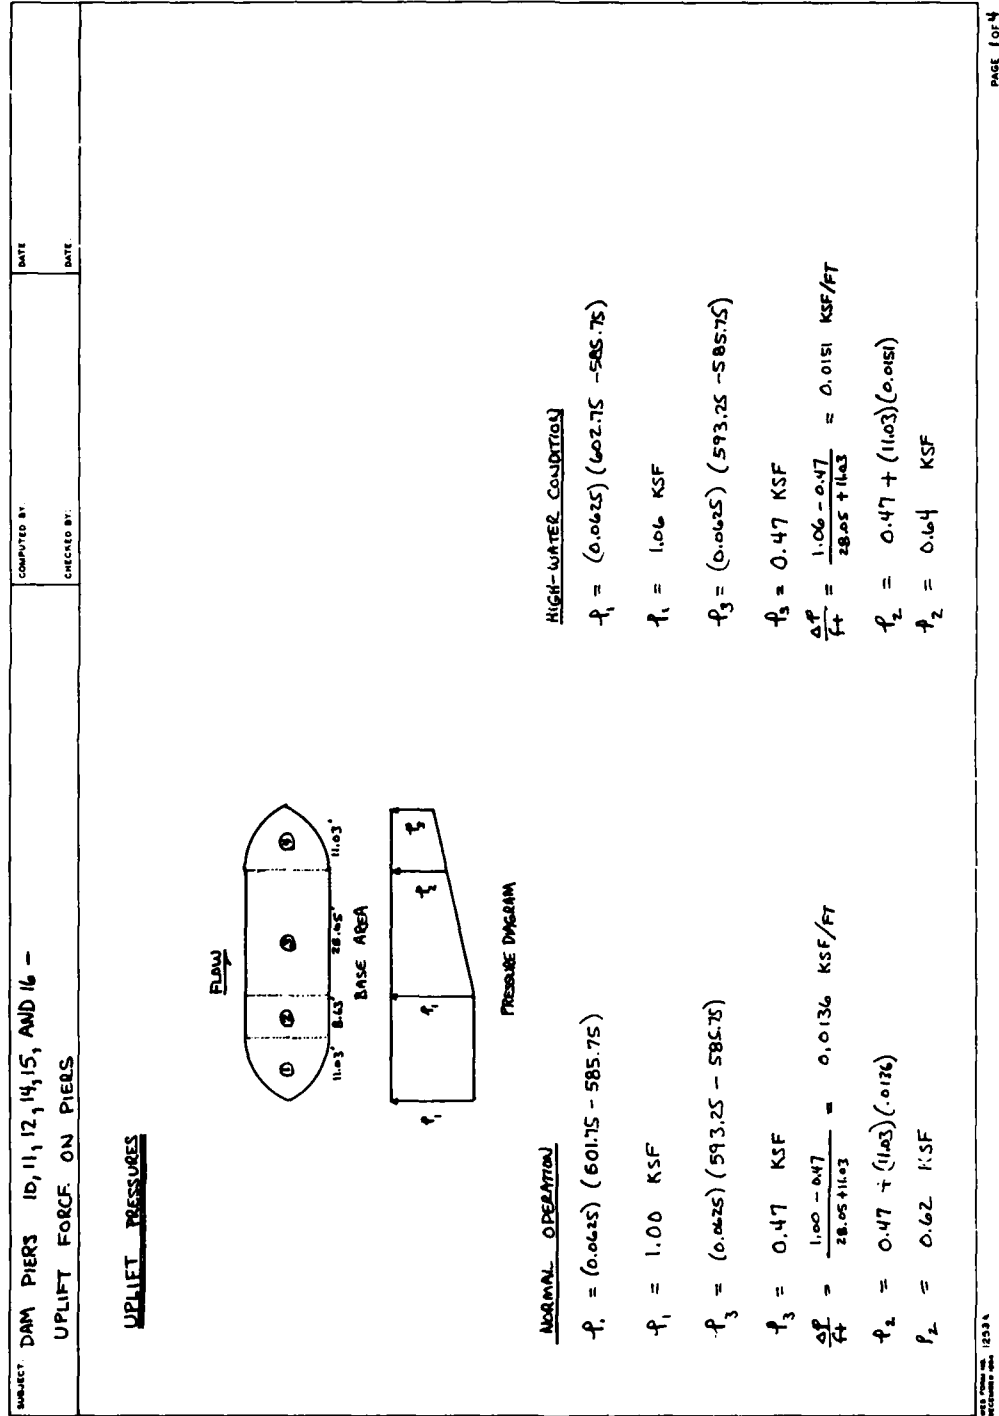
Uplift force on pier, dam piers 10, 11, 12, 14, 15, and 16, Soo Dam (Sheet 1 of 4)
